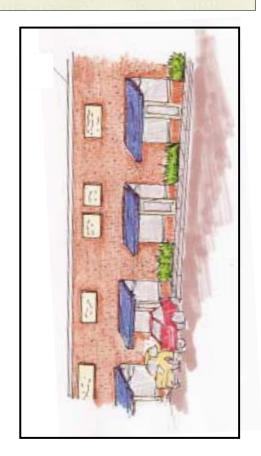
, Potential Design Impact, Existing Parking Lot, Valley View
